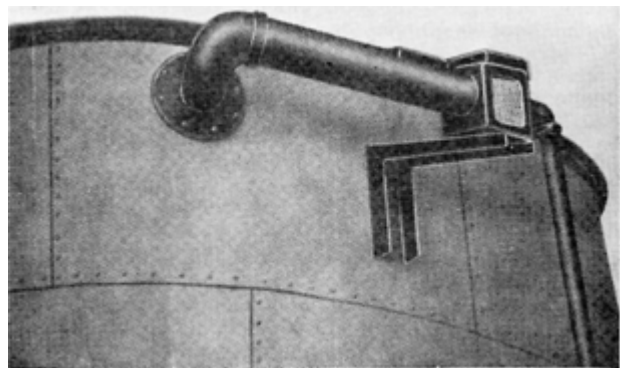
(a) Air foam maker in horizontal position at top of storage tank.
